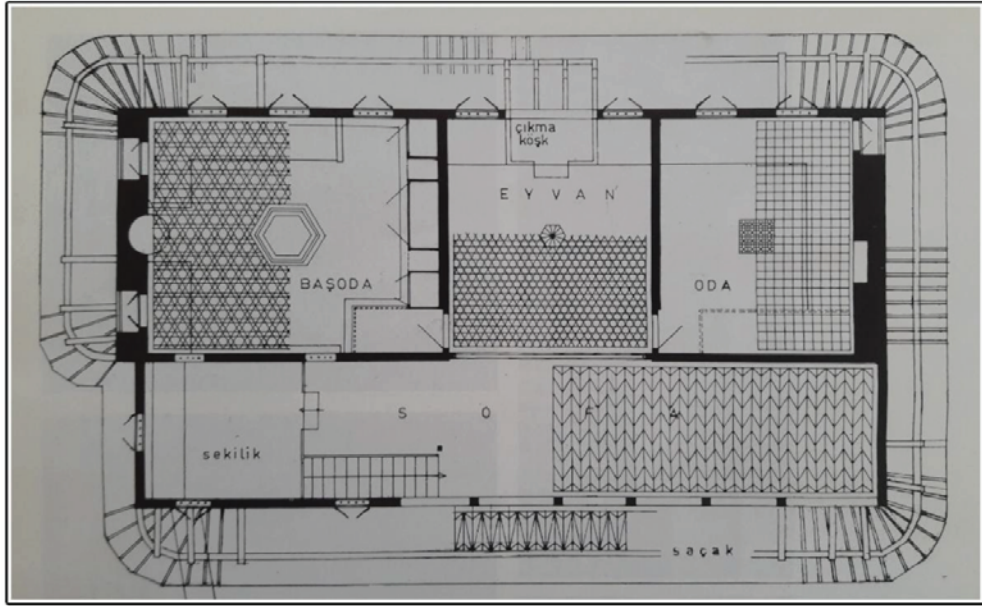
First floor plan of Muradiye House. (Source: Eldem 1984, p.100)
